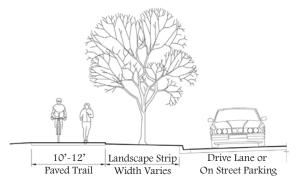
Roadside Greenway Trail/ Sidewalk
